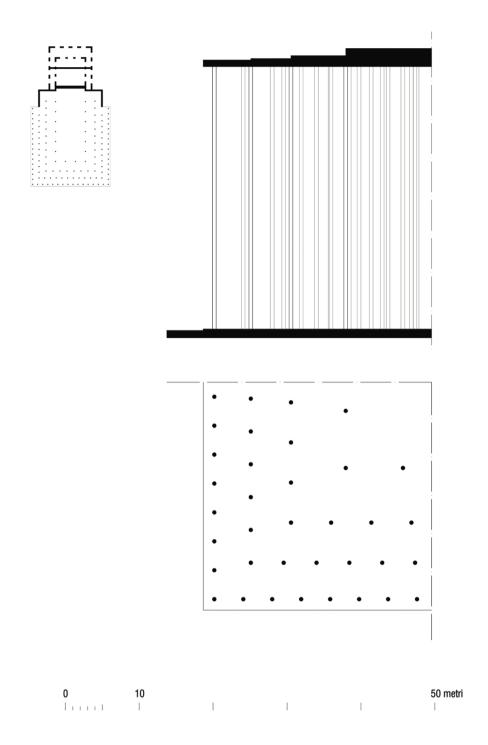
Festhalle by Heinrich Tessenow, Rugen, 1936. Schematic plan of the entire building and drawings (plan and section) of the selected part.
